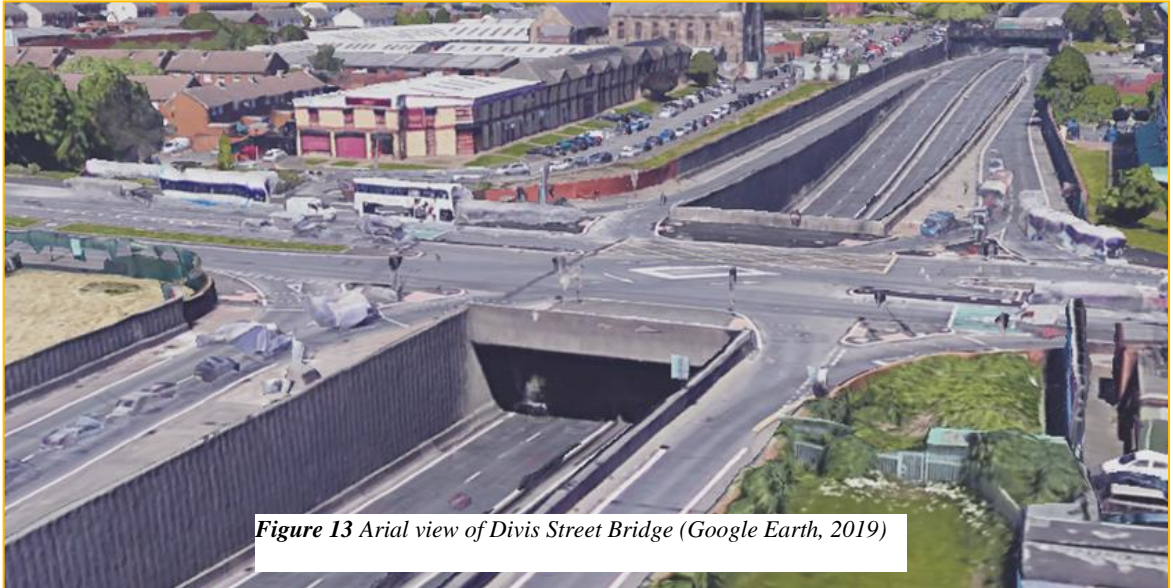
Aerial view of Divis Street Bridge (Google Earth, 2019)
